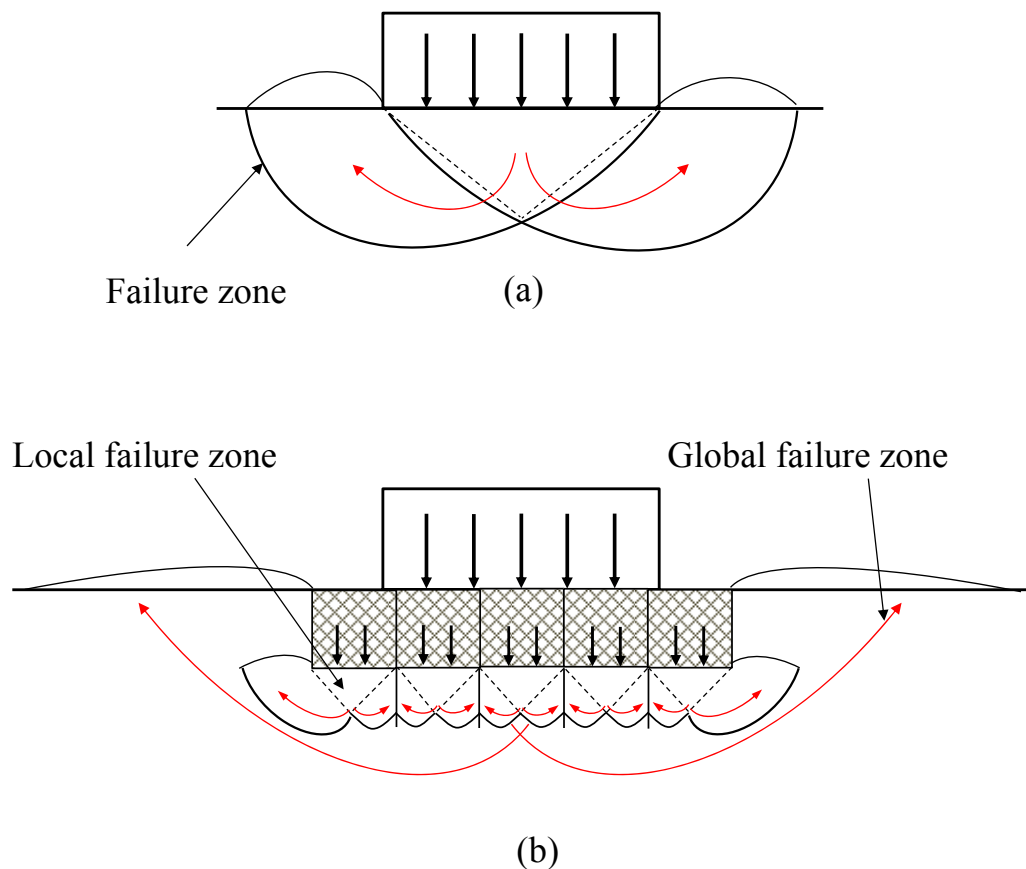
Typical failure plane under (a) unreinforced and (b) geocell-reinforced foundation
